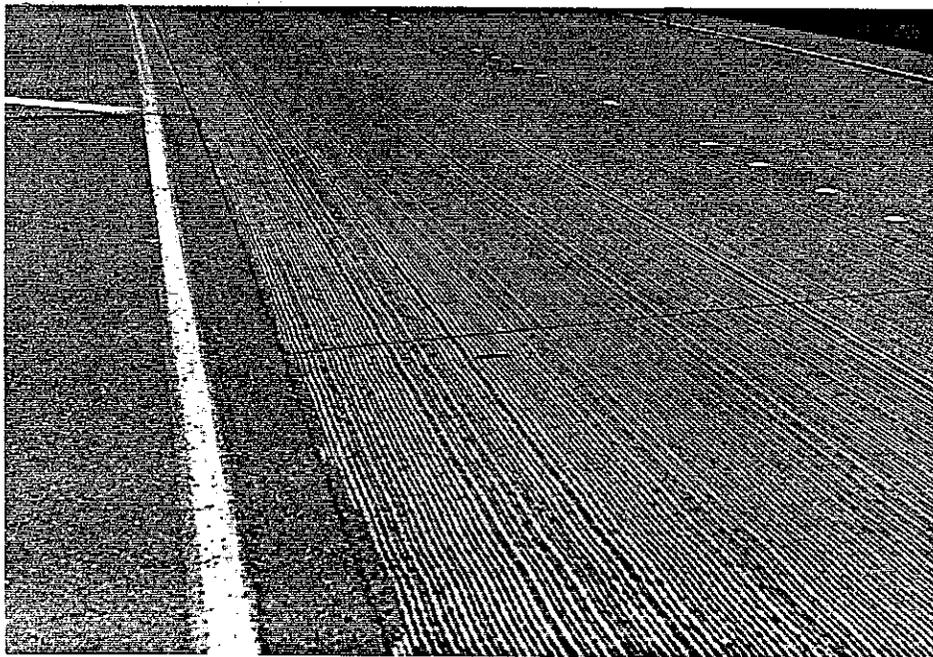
Longitudinal tine texture, 1/2 inch c-c.
